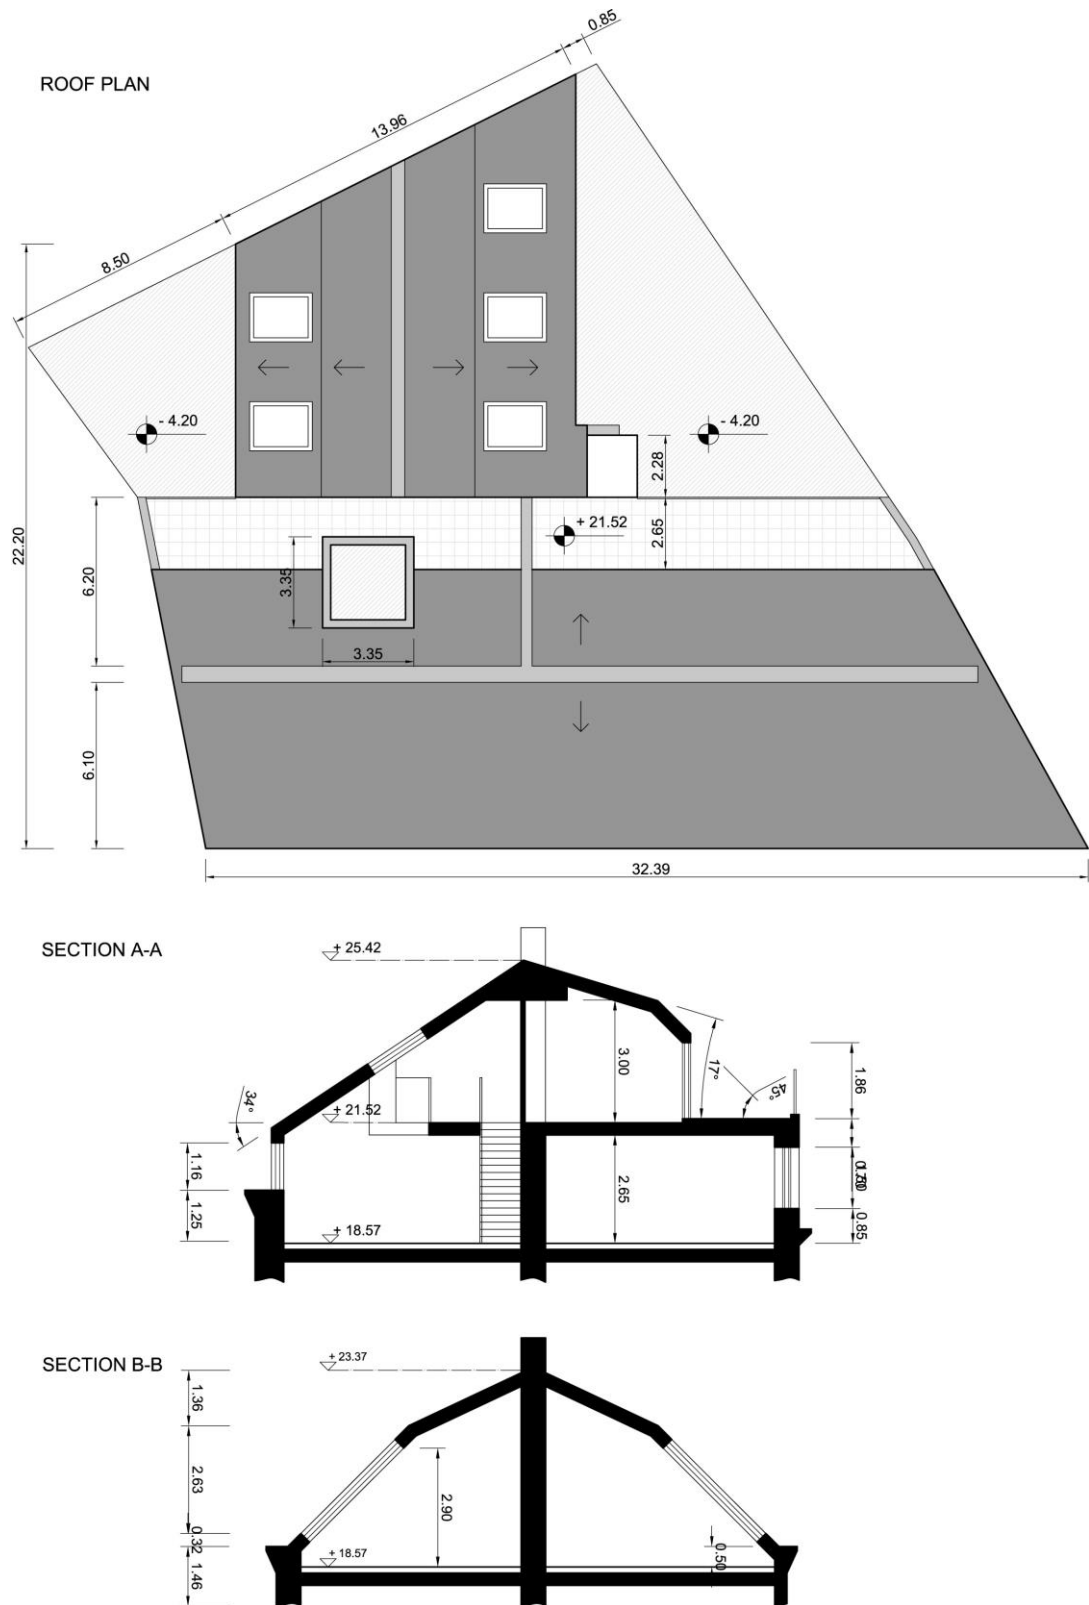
Attic extension in Lehargasse 13, 1060, Vienna. Roof plan and sections.
